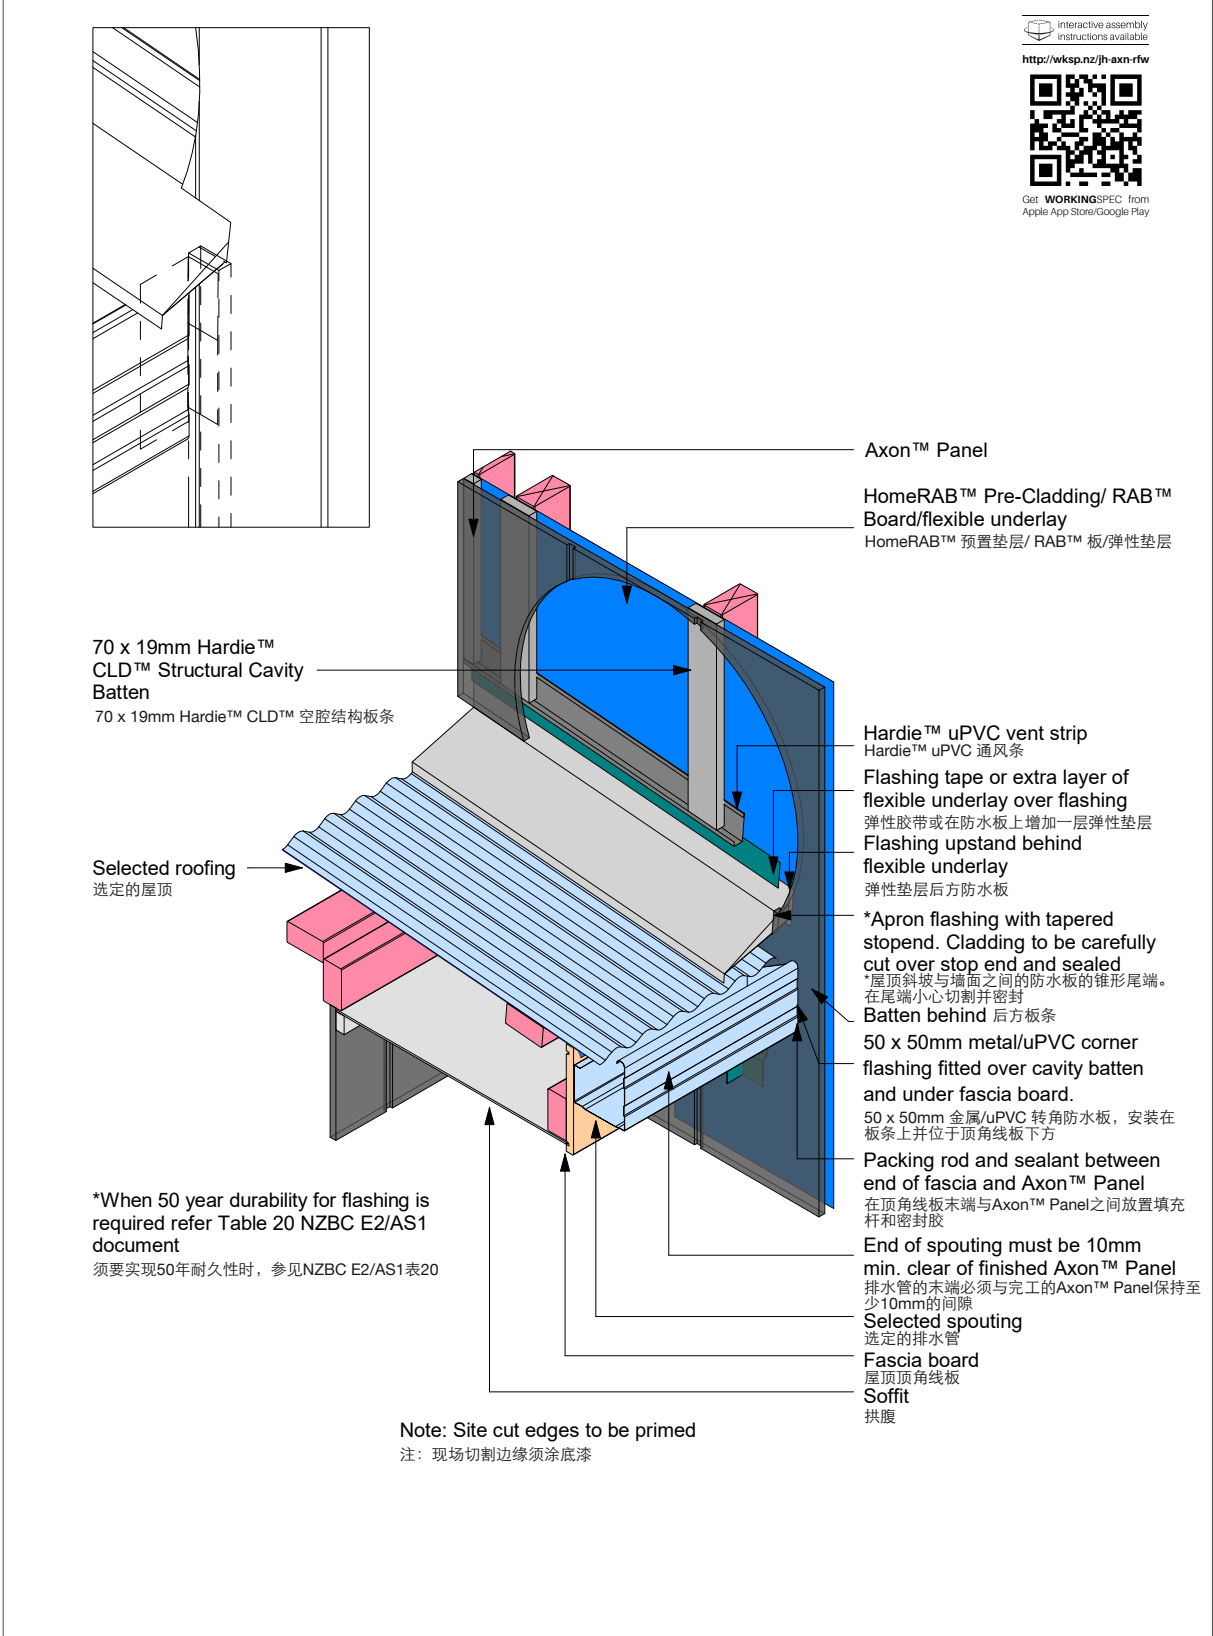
Enclosed roof to wall intersection | 图53: 封闭屋顶与墙体的交汇处
